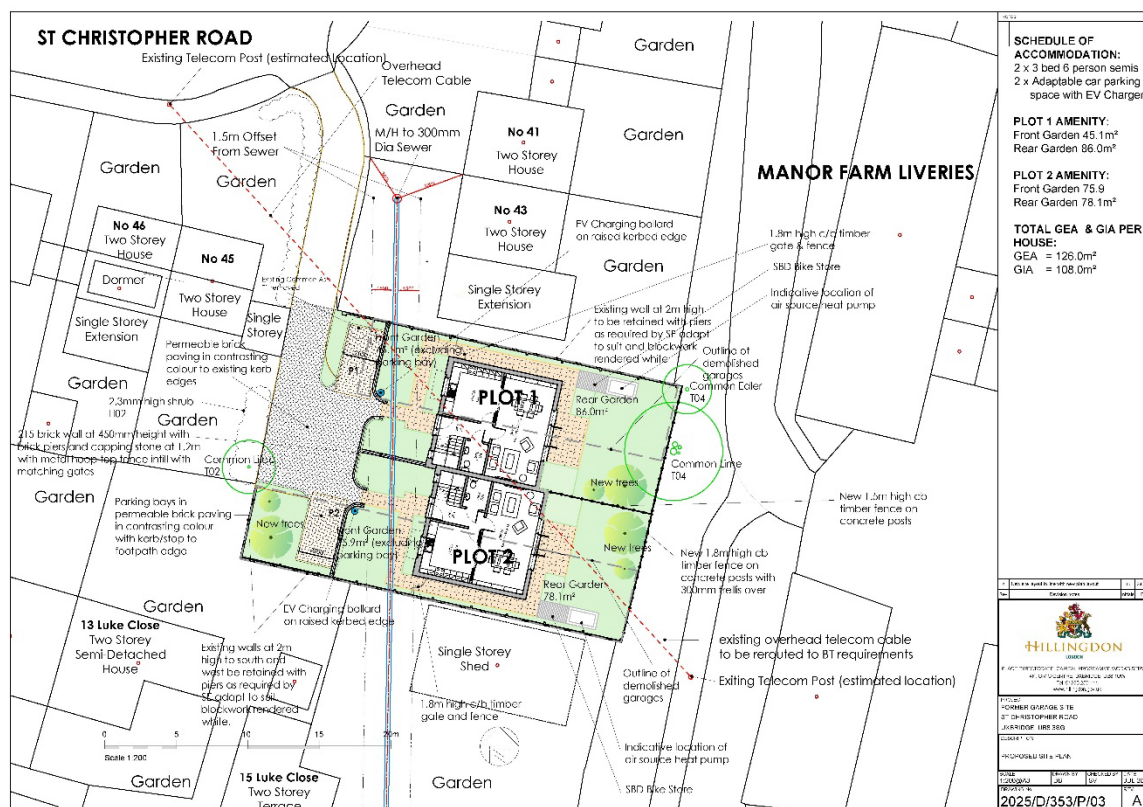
Proposed Site Plan Ref: 2022/D/353/P/03 rev A
